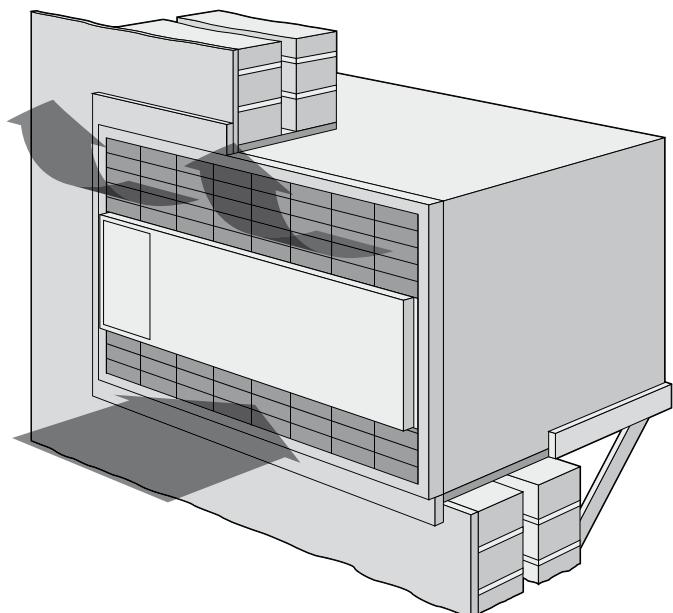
A through-the-wall type of packaged air conditioning room unit (reproduced courtesy of Andrews Industrial Equipment Ltd/SRL)
